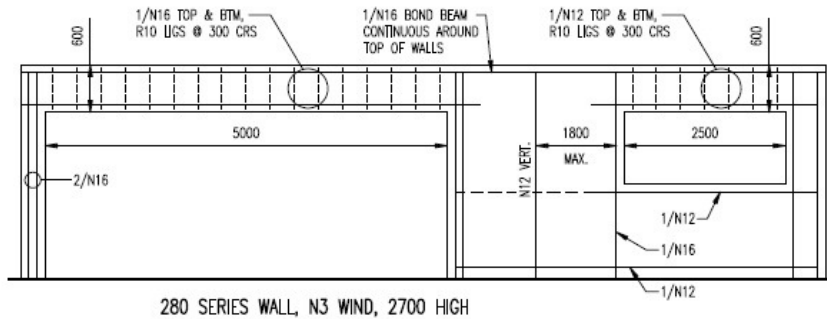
2700 High Wall, N3 Wind Rating, 280 Series ECO-Block (Max. roof load width: 10.0m)
